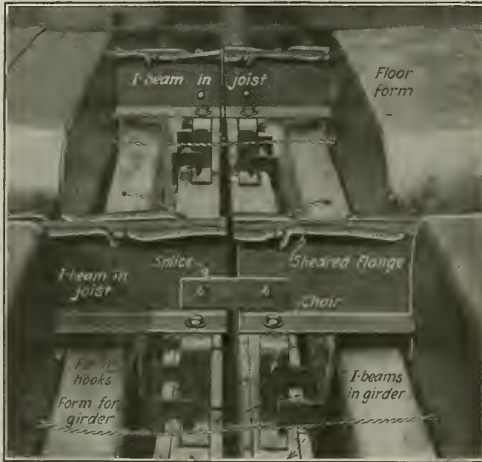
I-BEAMS AND FORMS IN PLACE FOR GIRDER, JOIST AND SLAB
